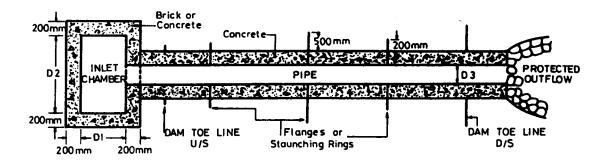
Plan View of Standard Drop Inlet (Stephens)
